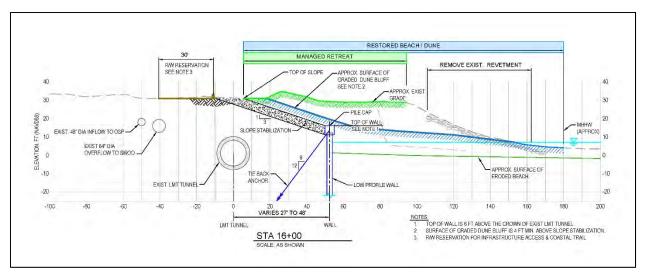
Low Profile Wall – North Reach Typical Section.
